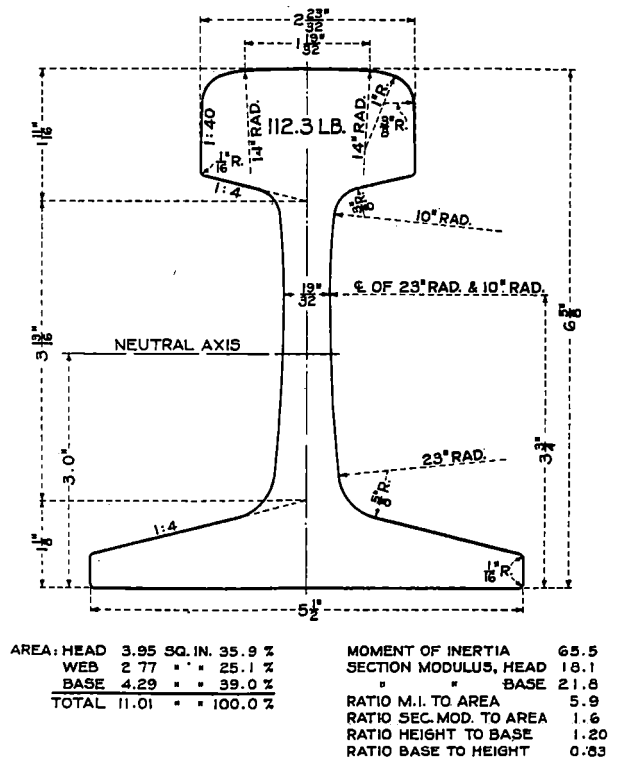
Modified AREA 112-RE Rail Section (U.S. Steel #11228).
